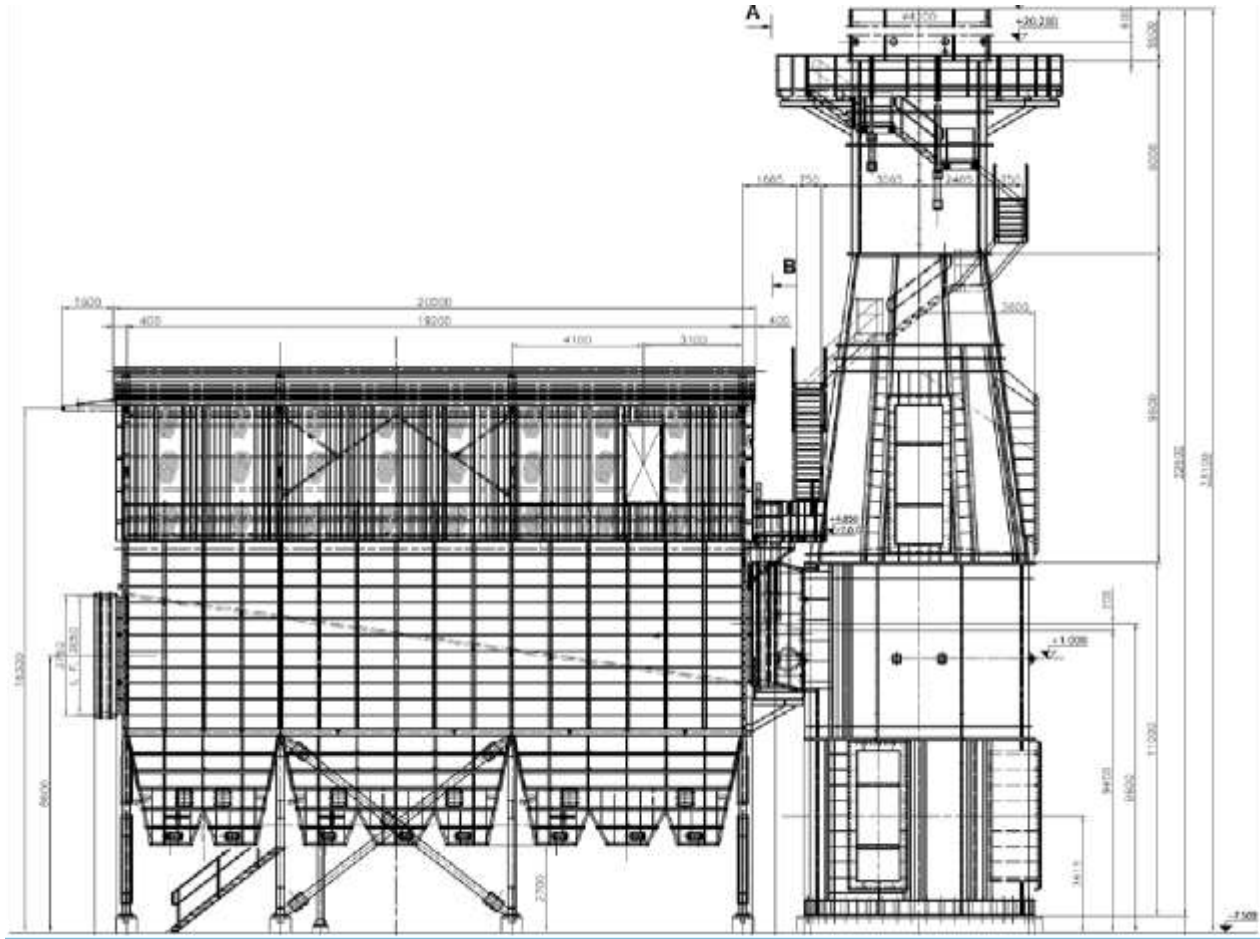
elevation view of the bag house (BH) and stack
